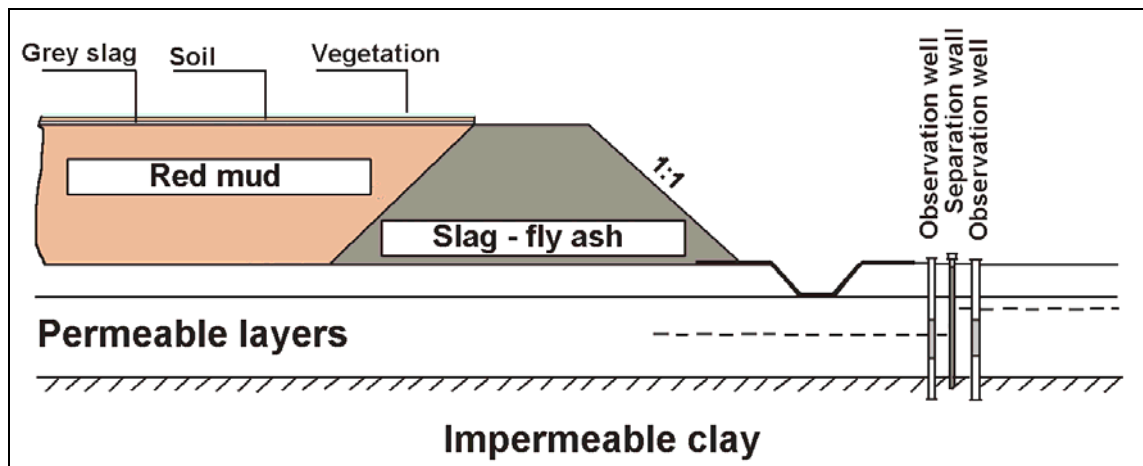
Cross-sectional view of TMF at Ajka showing the dam, pond, observation wells, separation wall and ground conditions, as well as the soil cover upon closure [91, Foldessy, 2002]
